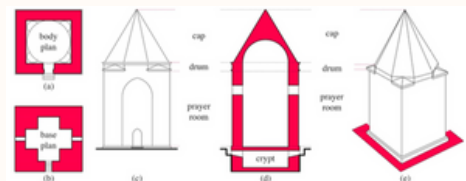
Kumbet of Melik Gazi in Kayseri: a Base plan, b body plan, c elevation, d section and main components, e axonometric view and main components. Image: authors based on Özgüç and Akok 1954
